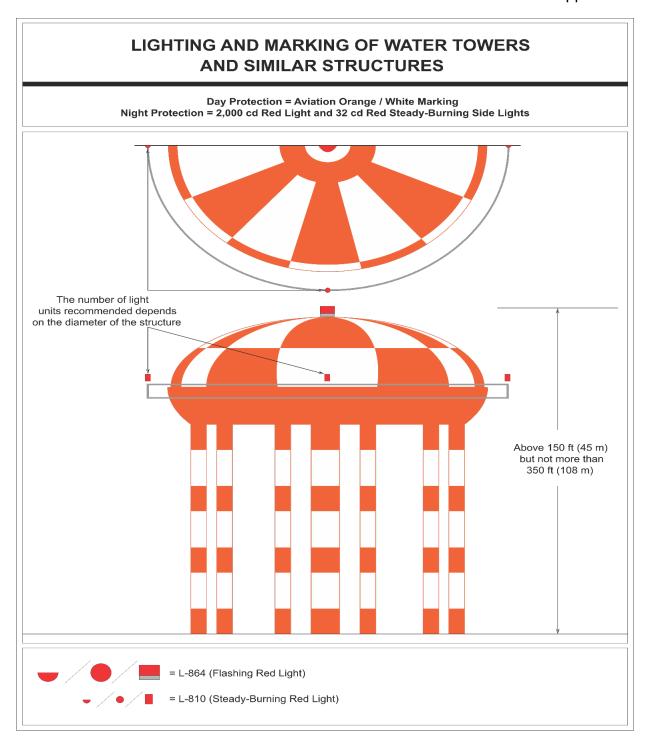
Marking and Lighting of Water Towers and Similar Structures
